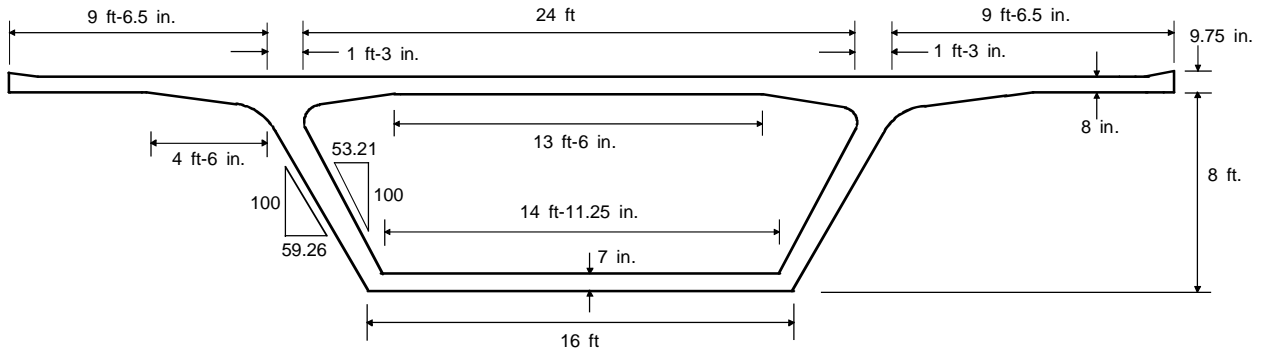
Cross-section of Santa Rosa Bay Bridge
